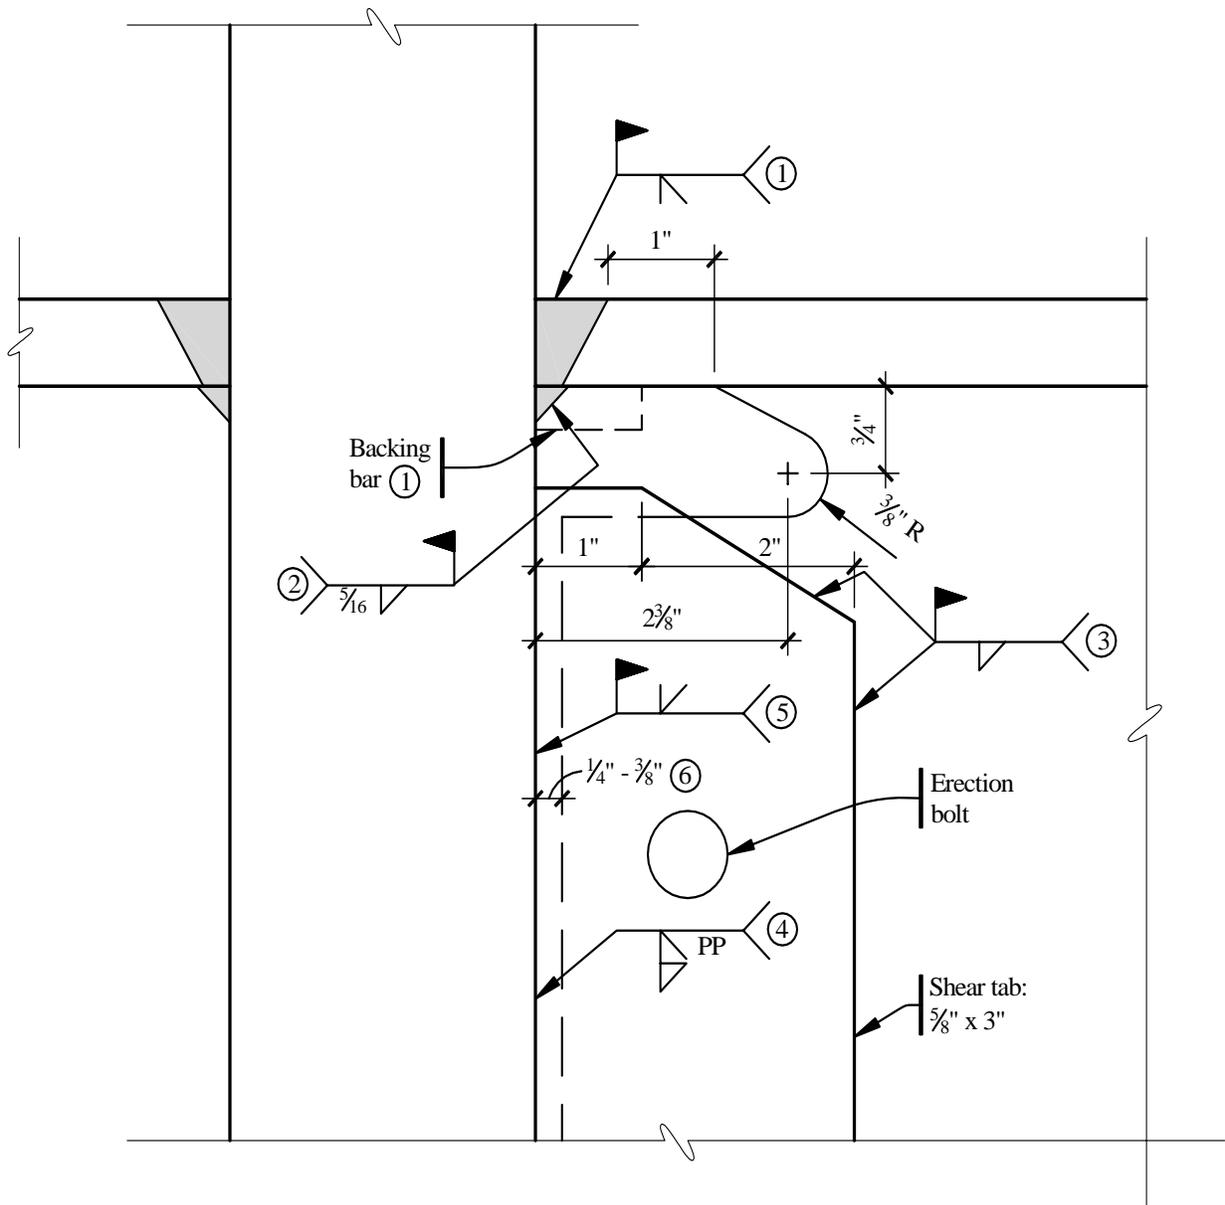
WUF-W weld detail (1.0 in. = 25.4 mm).
